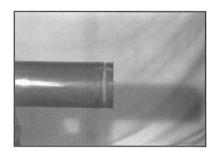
Mechanical Roll-Groove with Metal Gasketed Coupler
